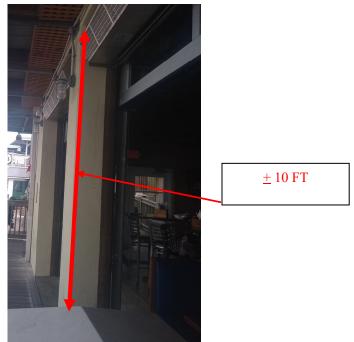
Location 25: Approximately 10 ft long new 16x12 concrete column. See detail 6/S104.
